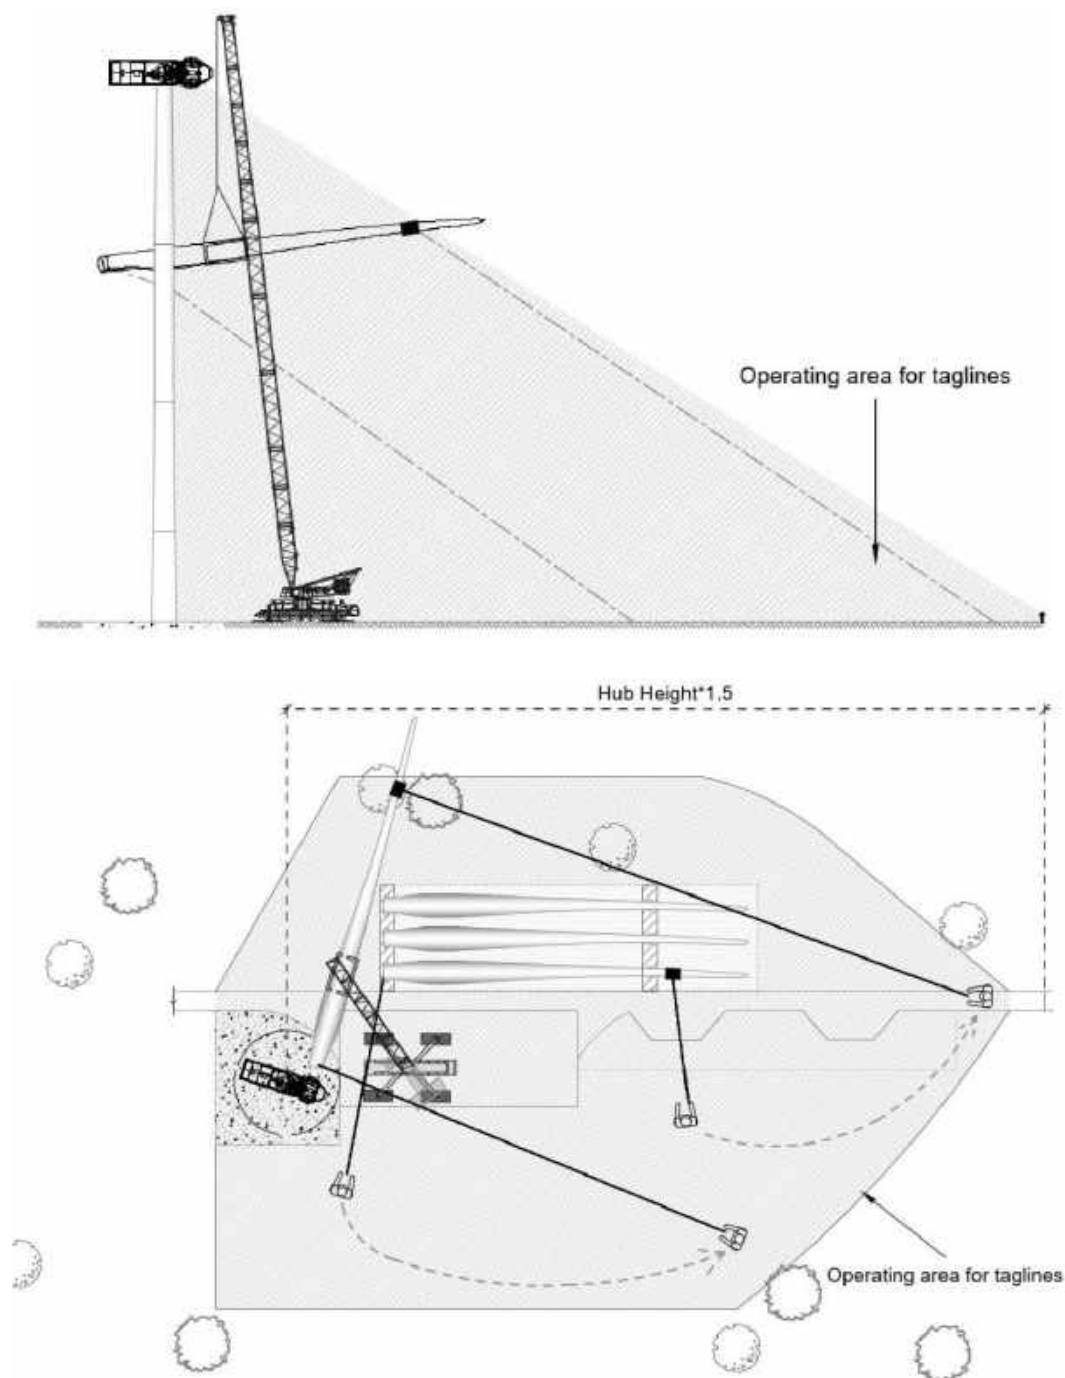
Indicative drawing of area requirements for the use of tag lines with single blade installation method
